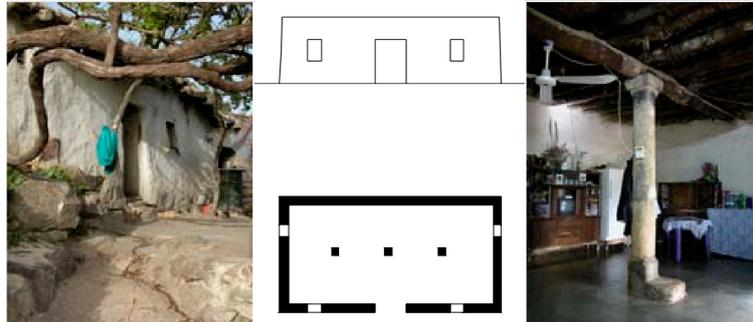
Basic rural Syrian house: exterior view (left), plan and elevation (center), and interior view (right). Source: CORPUS Project.
